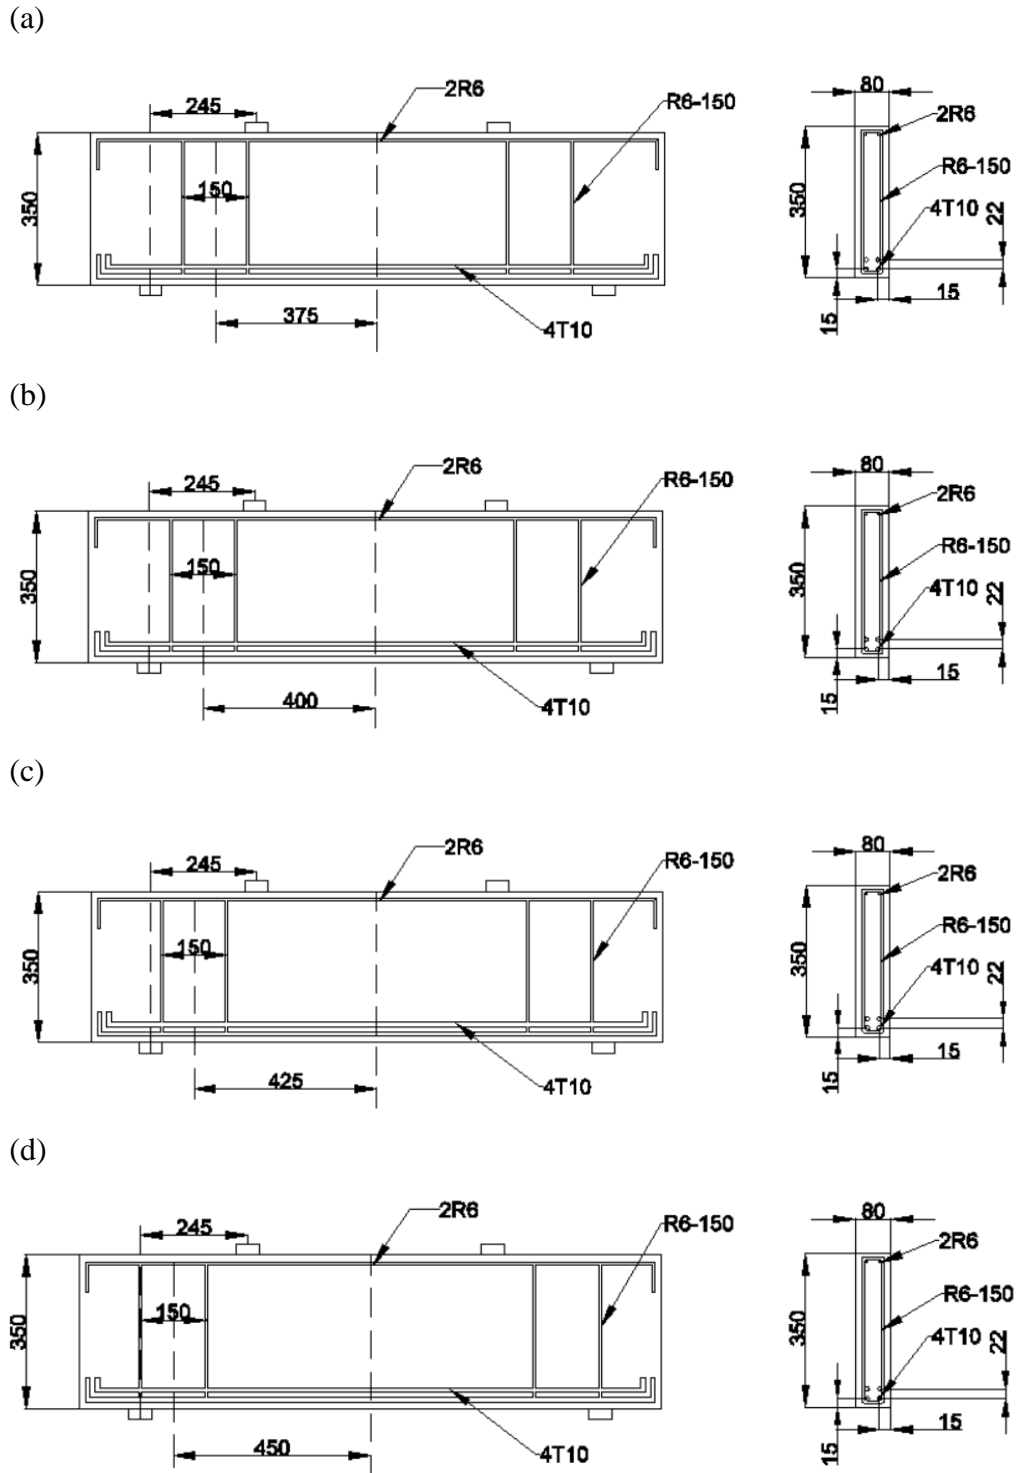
Detailing for Test Beams for Batch 3: Position of Shear Link (a: SVD-375 mm; b: SVD-400 mm; c: SVD-425 mm; d: SVD-450 mm)
